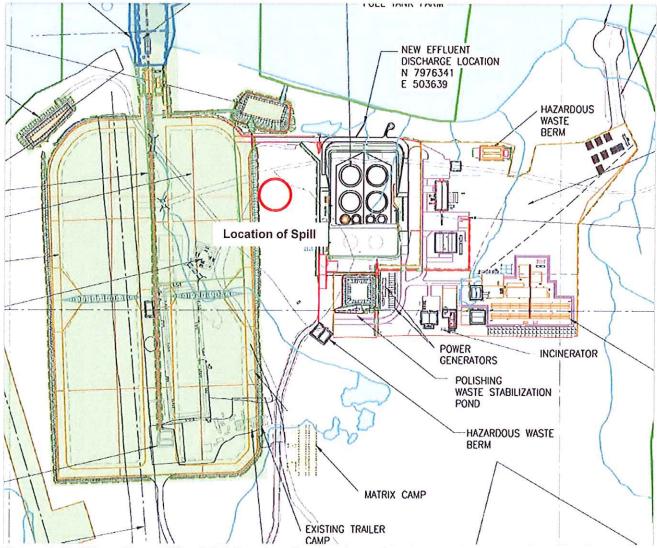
Spill Location - Milne Inlet Construction Laydown Area
